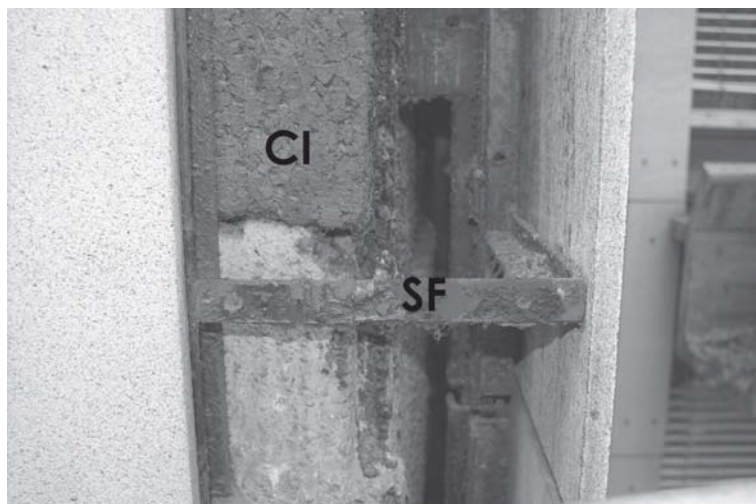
Construction of the façade. The slabs are fixed onto a steel frame (SF). The concrete structure is covered by cork isolation (CI)
